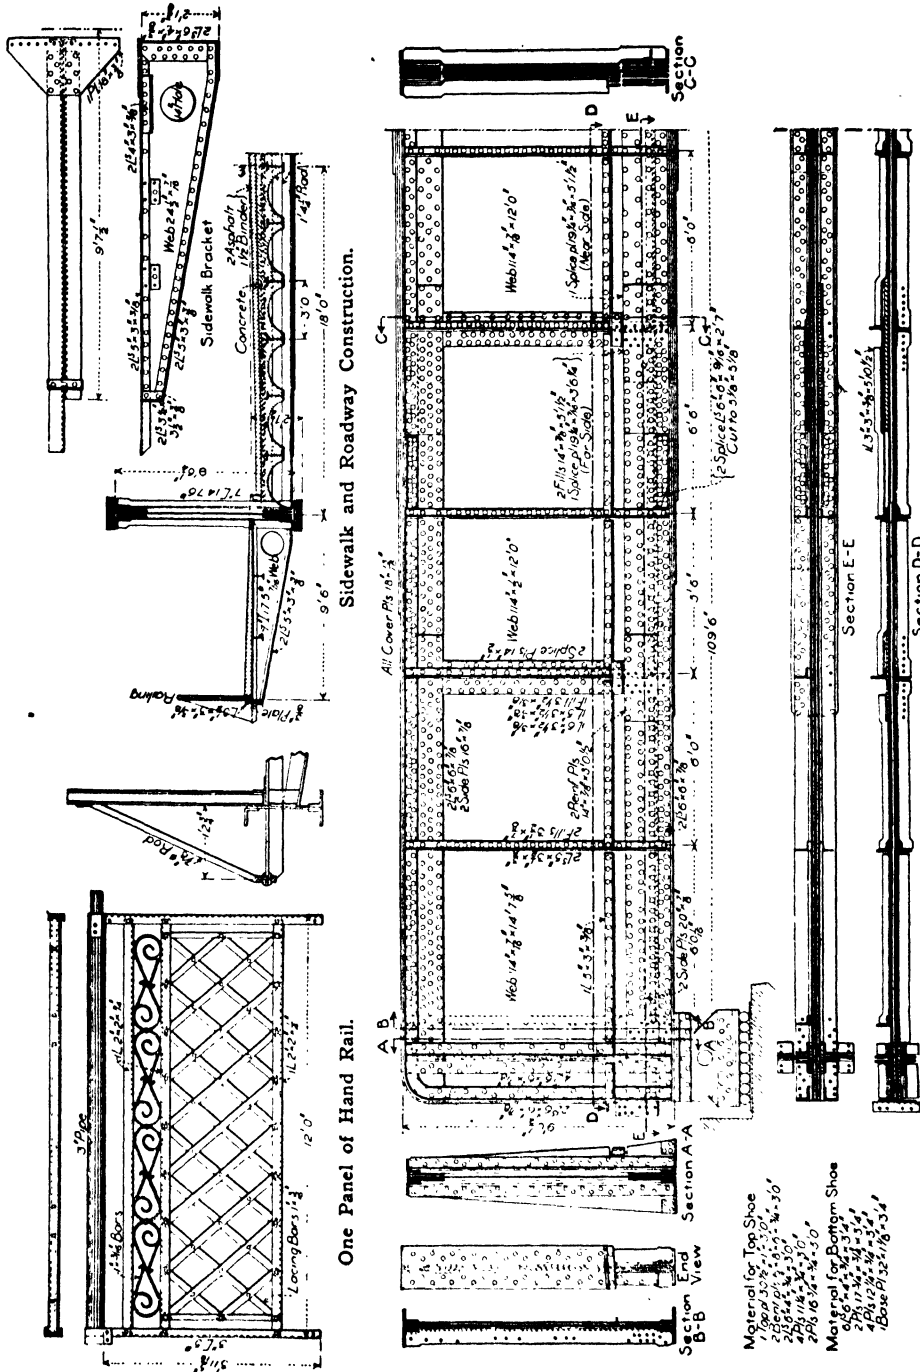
DETAILS OF 109-FT. PLATE GIRDER HIGHWAY BRIDGE. (Engineering Record, May 21, 1910.)
